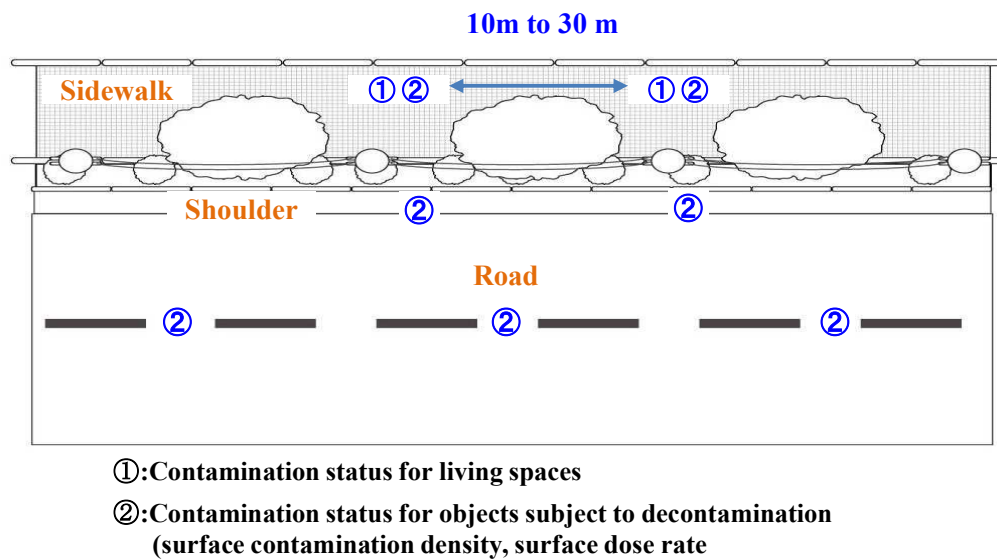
Example schematic diagram for reporting measurement points for use in decontamination and other measures for roads.
